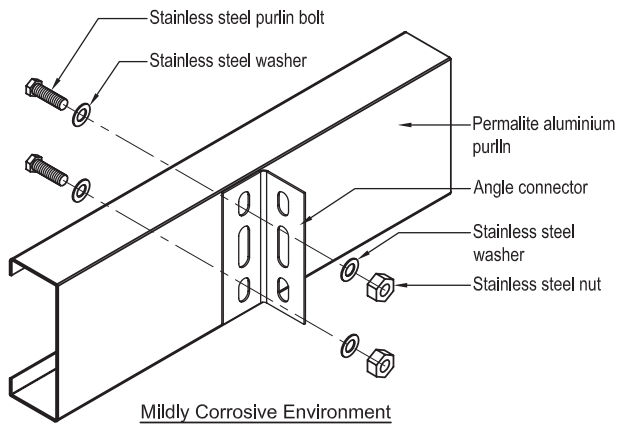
Typical purlin to angle connector/clamp plate connection detail
